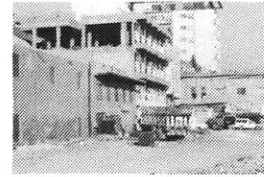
Concrete frame in Baghdad. Note the brick in-fill walls.
